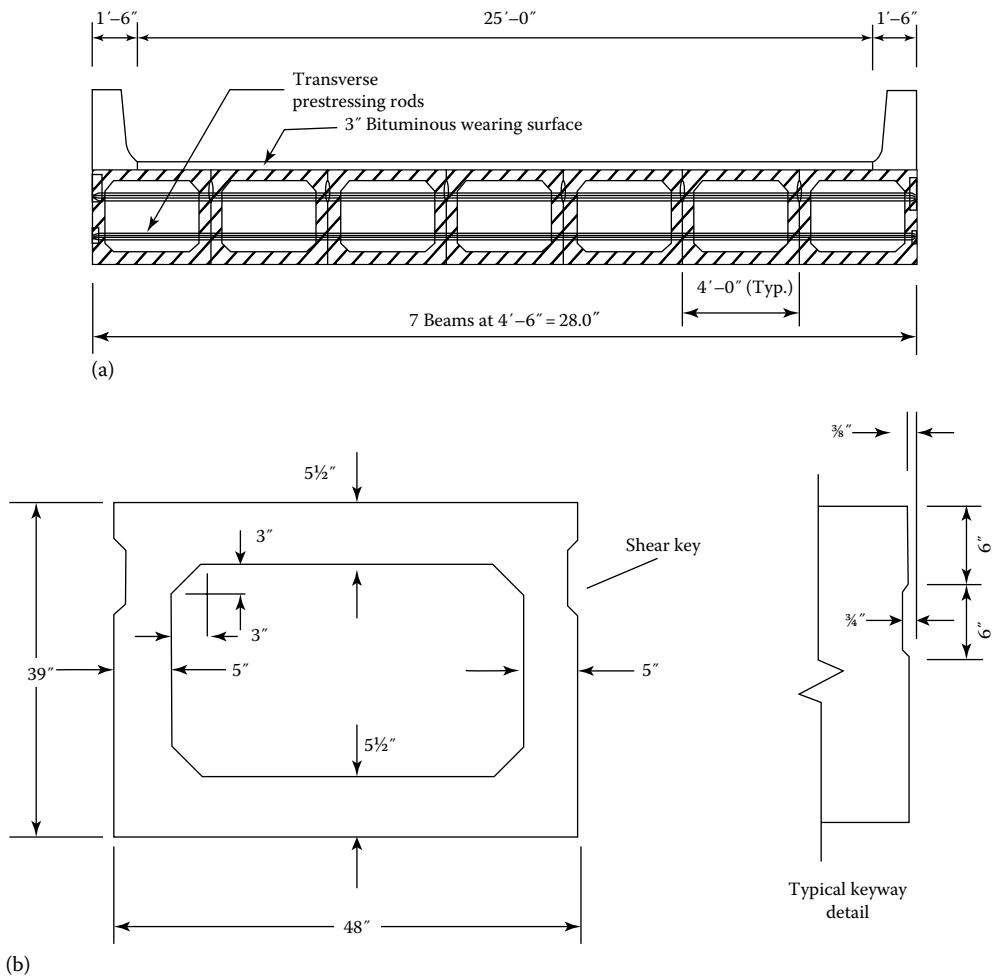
(a) Prestressed adjacent box beam bridge cross section. (Adapted from Prestressed Concrete Institute, *Precast Prestressed Concrete Bridge Design Manual*, Chicago, IL, 2003.) (b) Cross section of AASHTO-PCI BIII-48 box beam.
